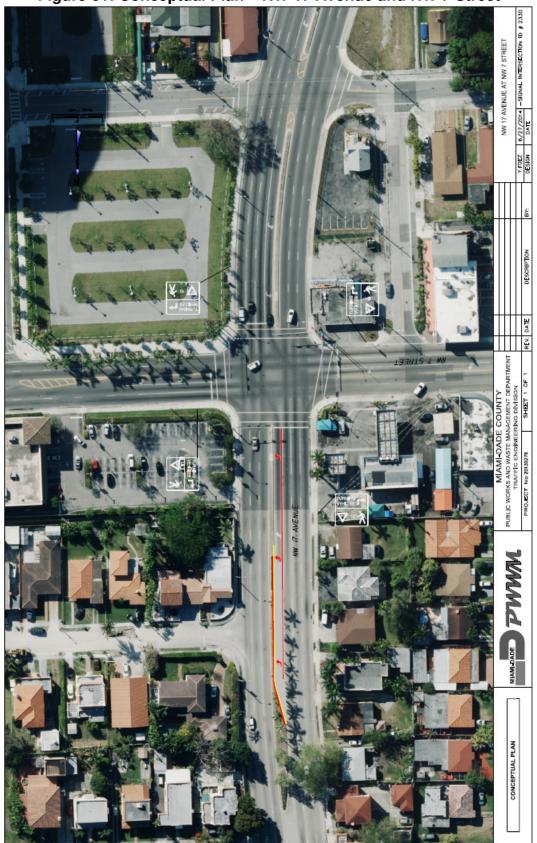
Conceptual Plan – NW 17 Avenue and NW 7 Street
